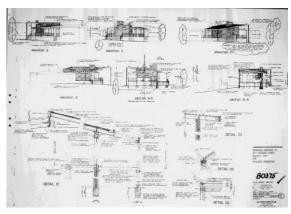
Elevations of the proposed family room designed by architect Peter Sandown in 1986. (Source: BP 80378)
